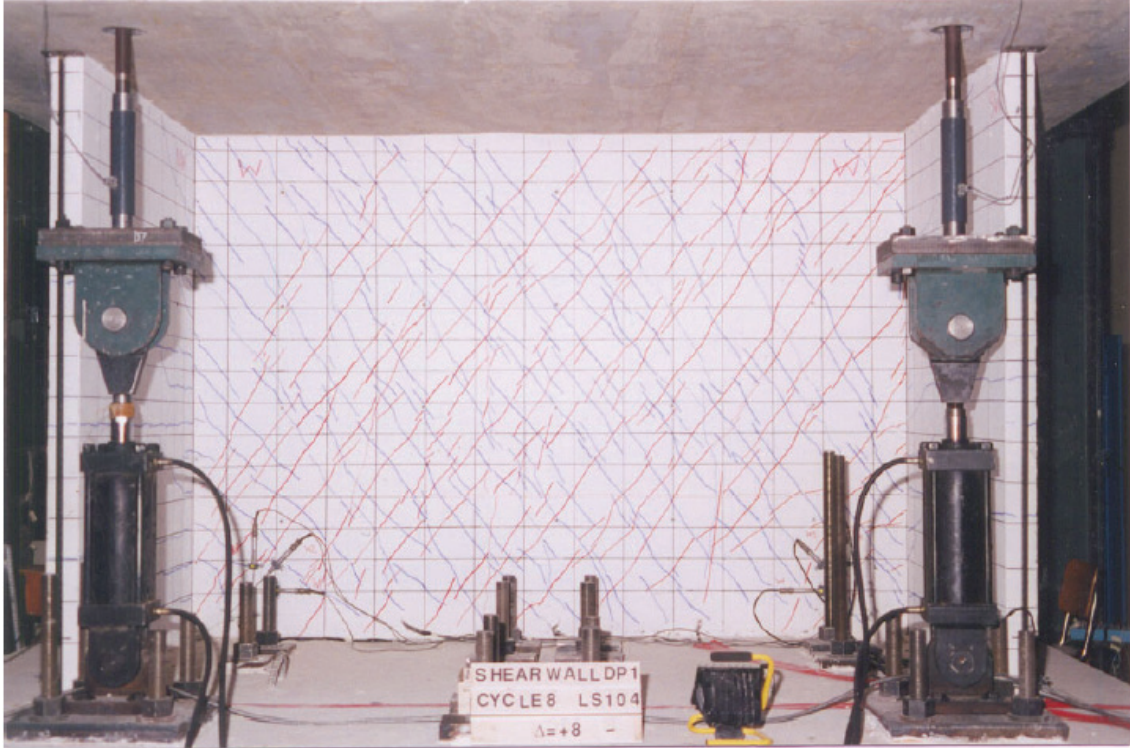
Cracking pattern for wall DP1 tested by Palermo and Vecchio (2002) at a maximum shear crack width of 0.5 mm
